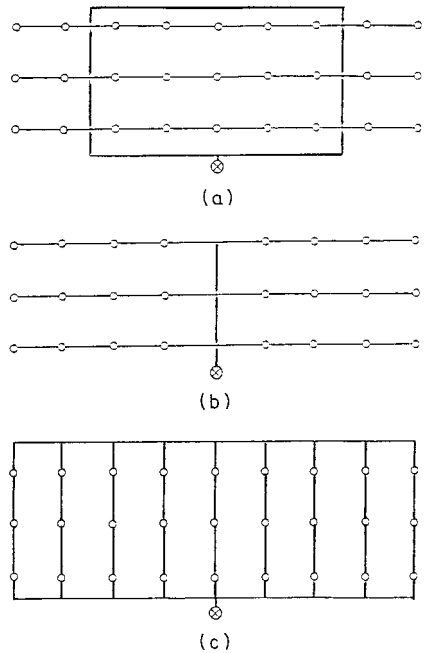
Typical sprinkler system piping layouts: (a) grid; (b) tree; (c) loop.
